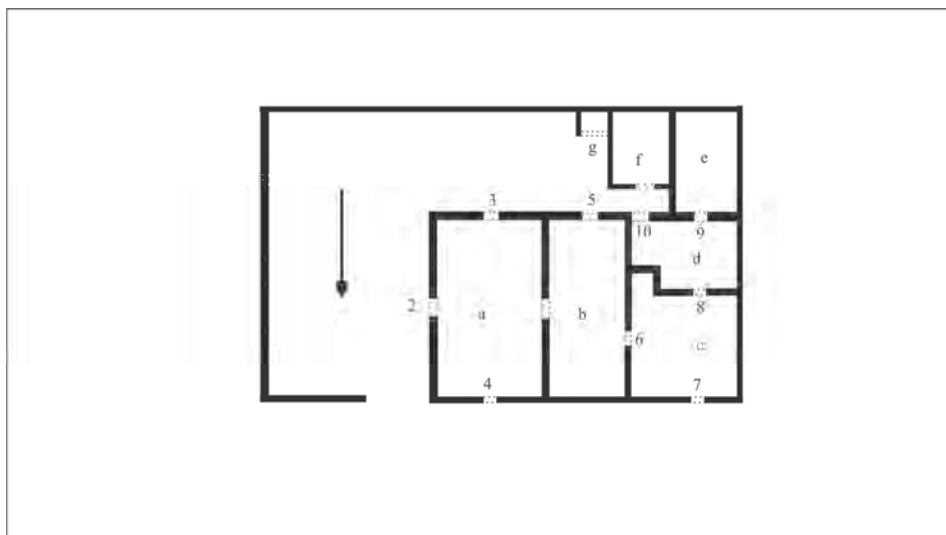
Plan of the roman house I (after KIRÁLY 1891)
